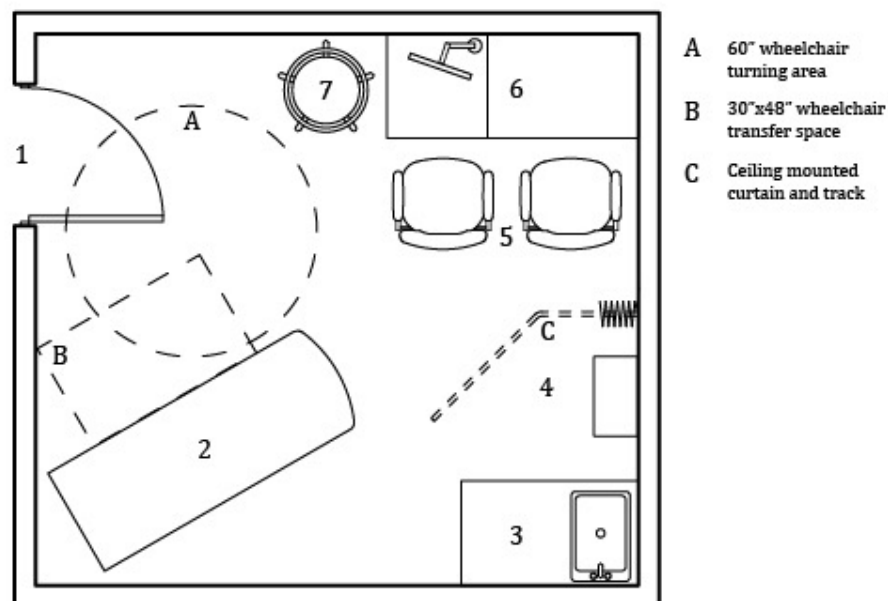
PROPOSED FLOOR PLAN 12' X 11'²²
